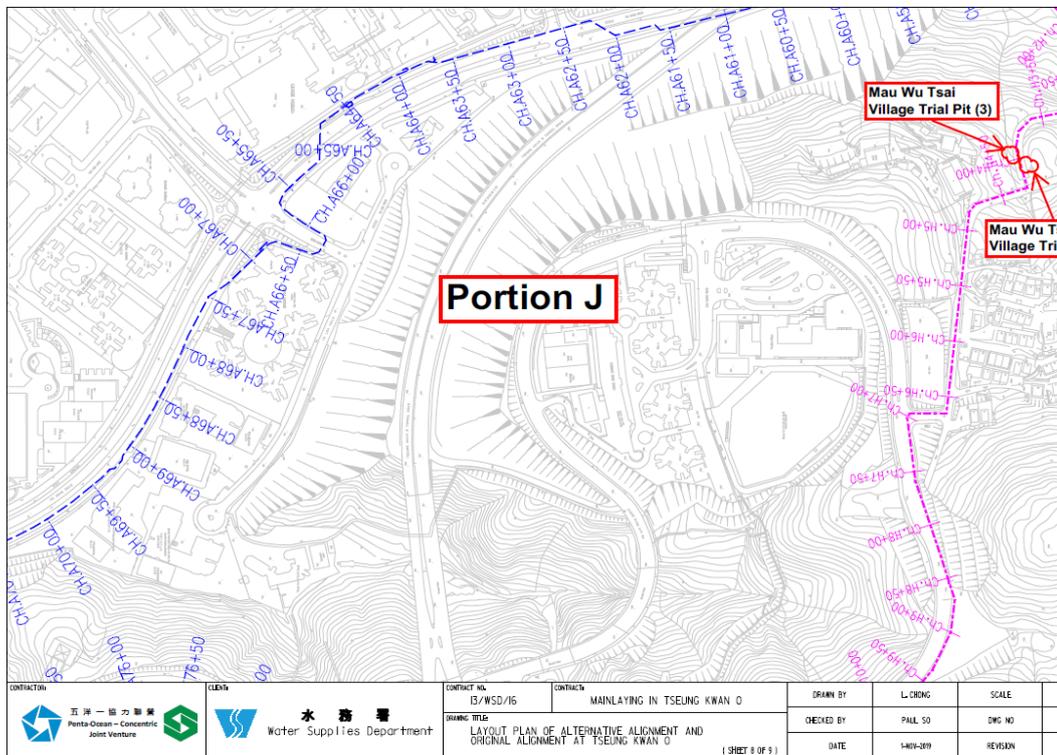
Location Plan for Mau Wu Tsai 2 & 3
